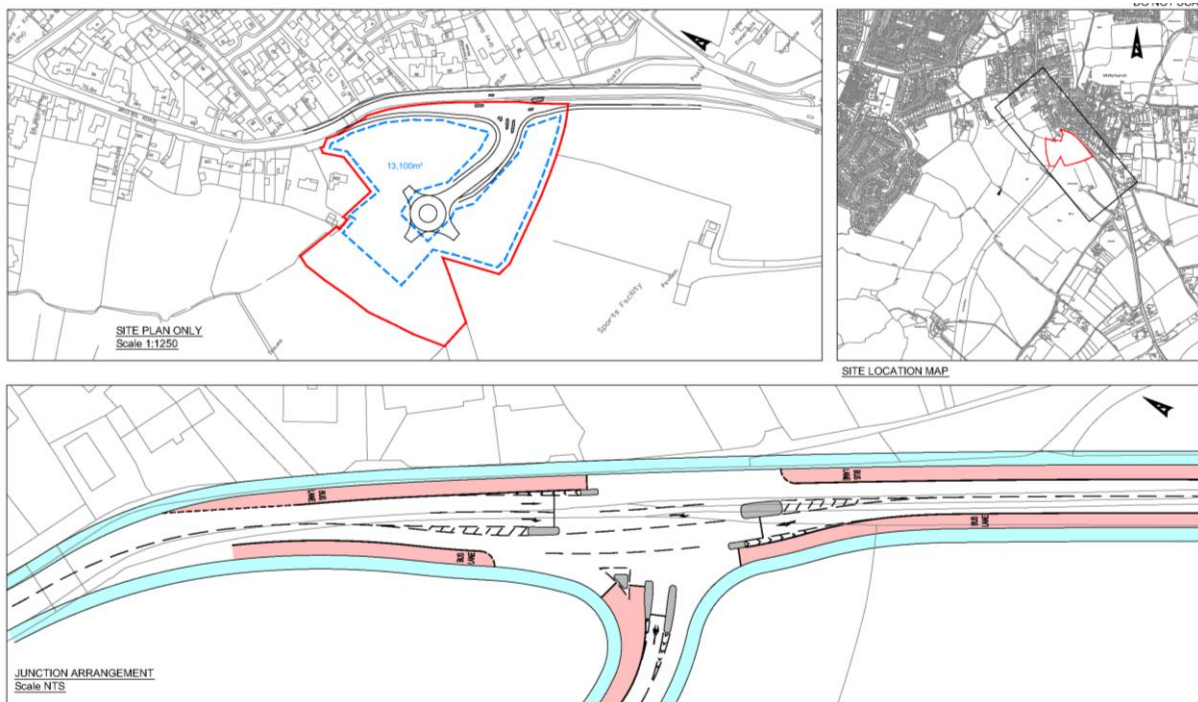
Option K2 – Whitchurch P&R Site 5 west of A37, south of Church Road
